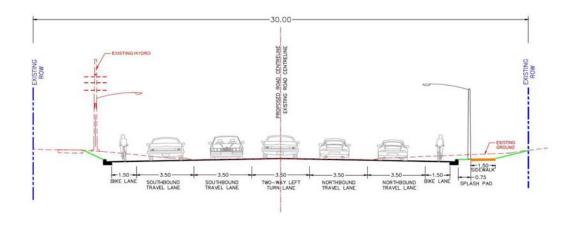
Typical Section - Matheson Boulevard West to Britannia Road West (Sta. 11+860)
